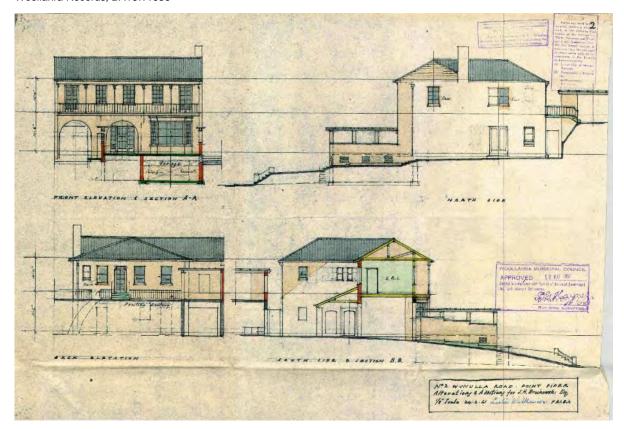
Plans from BA273/1961 for J H Broinowski (Source: Woollahra Records)
